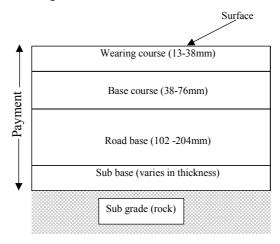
Structural layers in road construction. Numbers refer to thickness of layers
